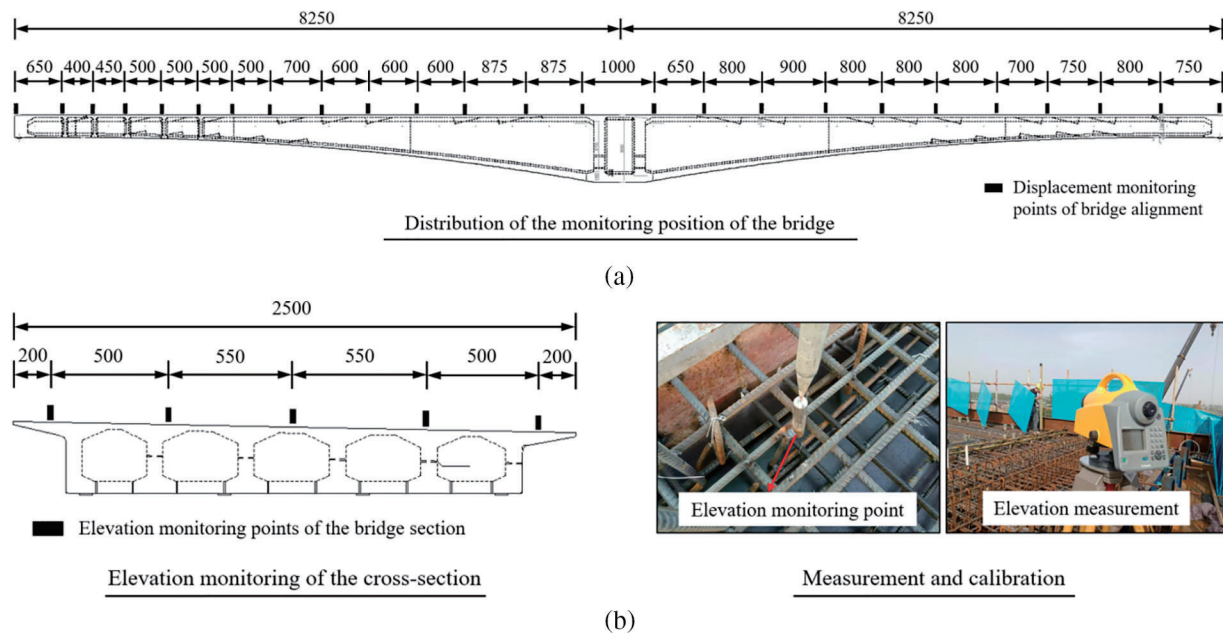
Elevation measuring point arrangement of the SG/SF Ramp Bridge: (a) Full-bridge longitudinal linear monitoring points; (b) Transverse measuring point of the bridge section (unit: cm)
